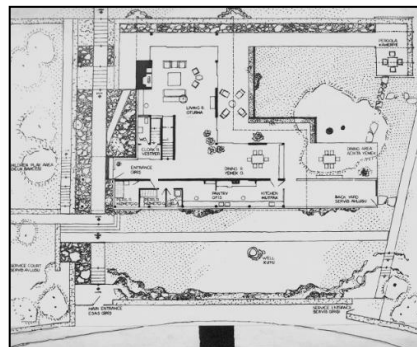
Ground floor plan of Rıza Derviş villas (1956) [82]
